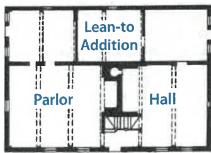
A typical New England saltbox features a steeply sloping roof to shed snow and a floor plan organized around a central chimney to conserve heat.
